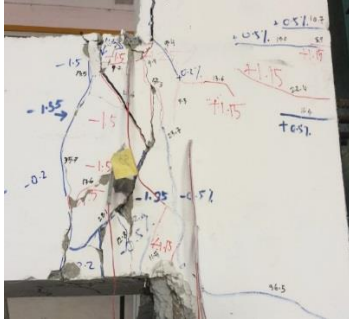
Vertical cracks on the beam-column interfaces at -1.5% drift
